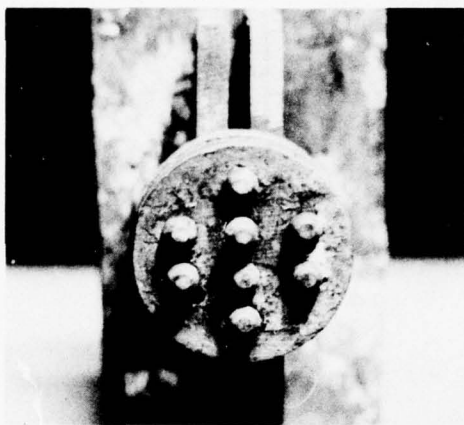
Heavy rusting to round anchor plate on outside face of the seaward end of beam 13
